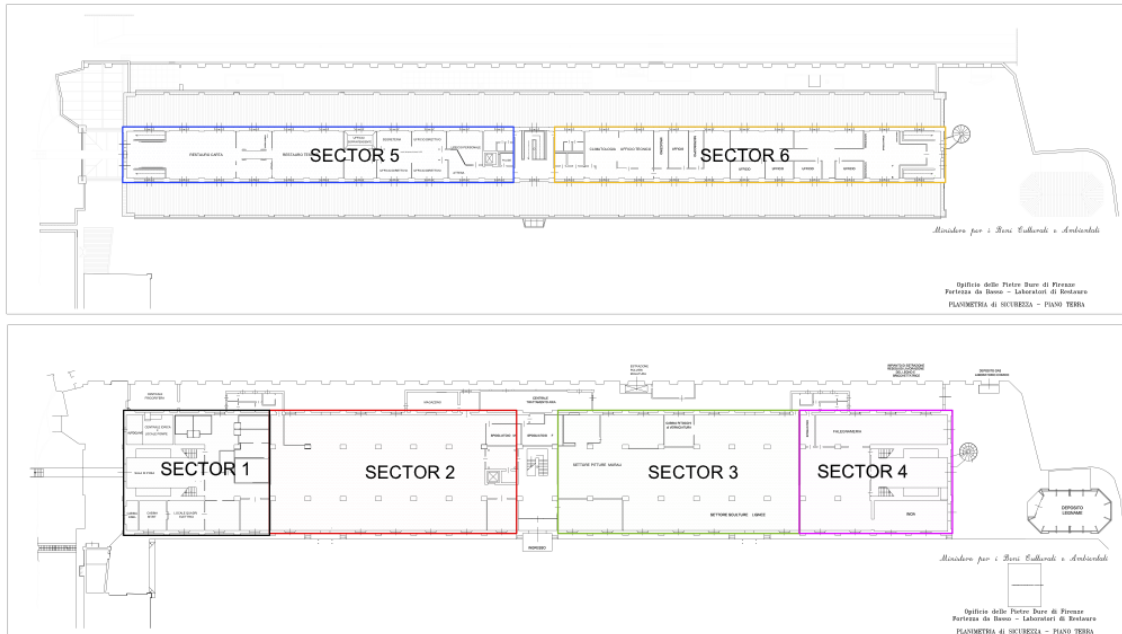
Ground floor and first floor of the OPD Building in Fortezza da Basso, [38].
